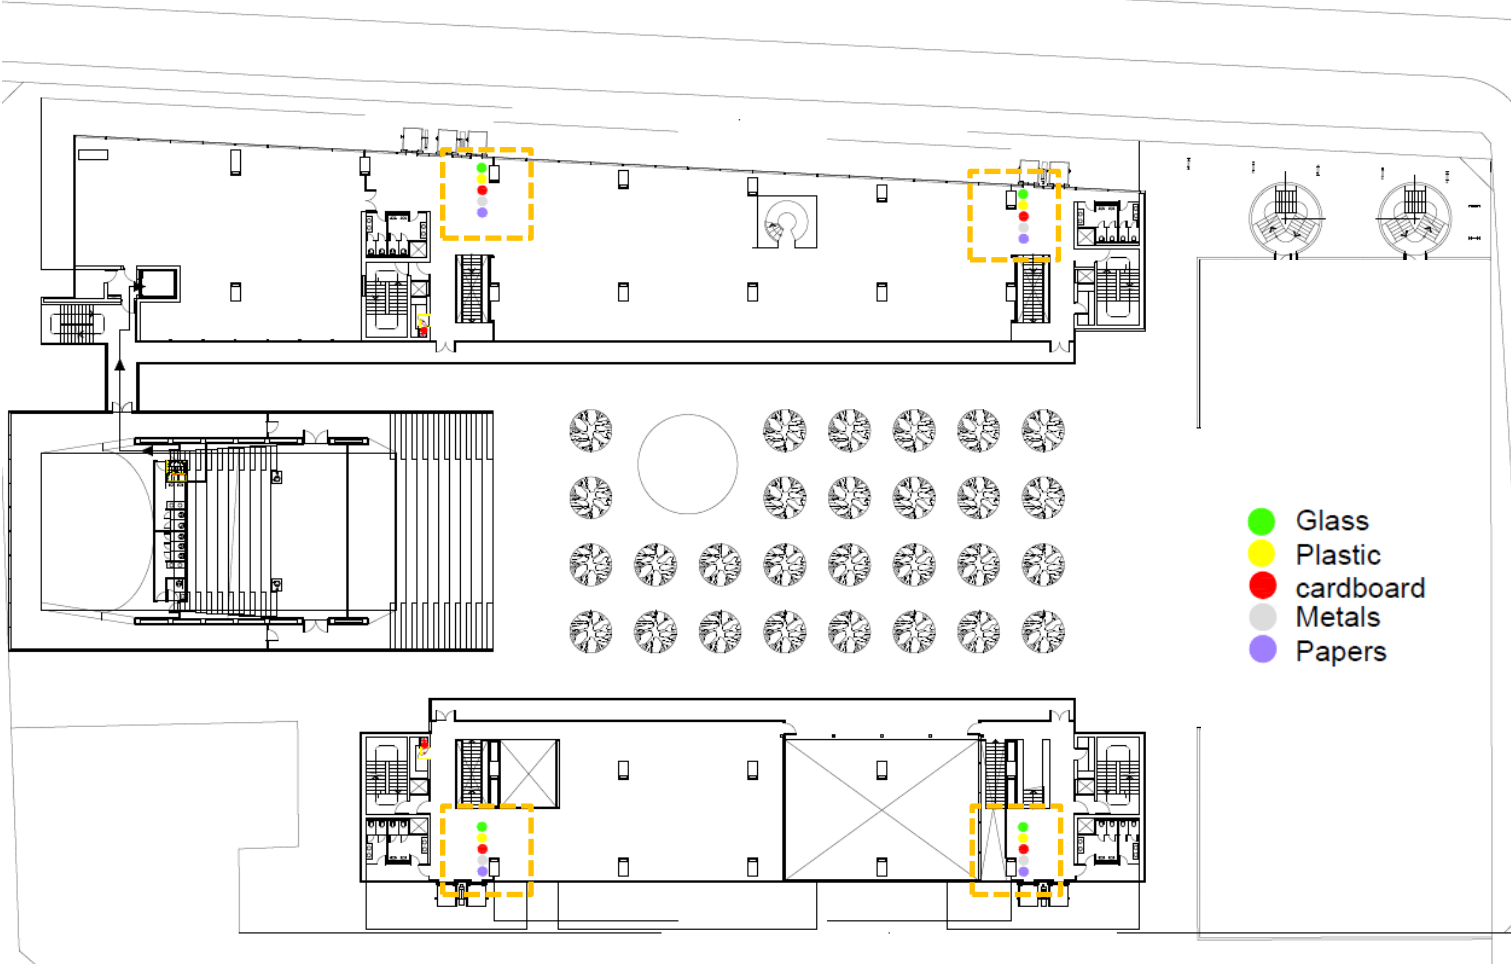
Location of recycling bins in every level of the building from 2nd to 7th floor.
